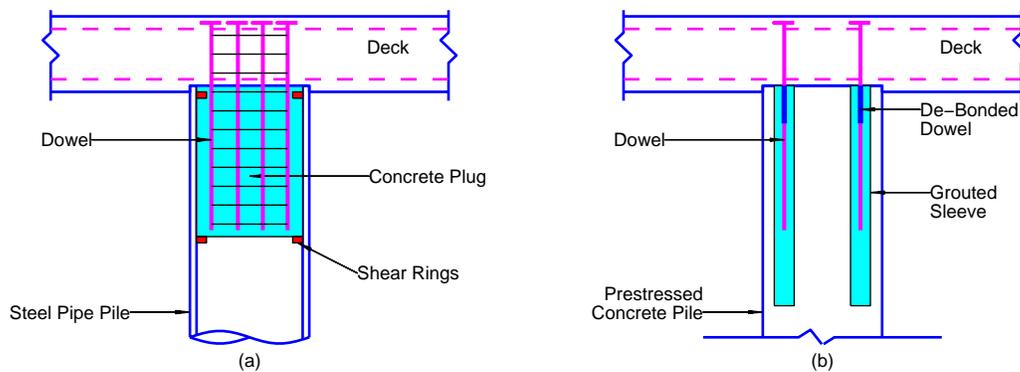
Partial-moment-connection of piles to the deck in marine oil terminals: (a) Concrete-plug connection for hollow-steel piles; and (b) Dowel-sleeve connection for pre-stressed-concrete pile.
